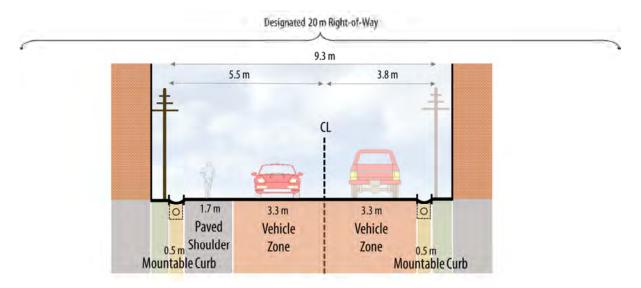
9.3 m Platform Semi-Rural Cross-Section with Paved Shoulder for Belfountain Village (Community Centre to north/west of Caledon Mountain Drive)
